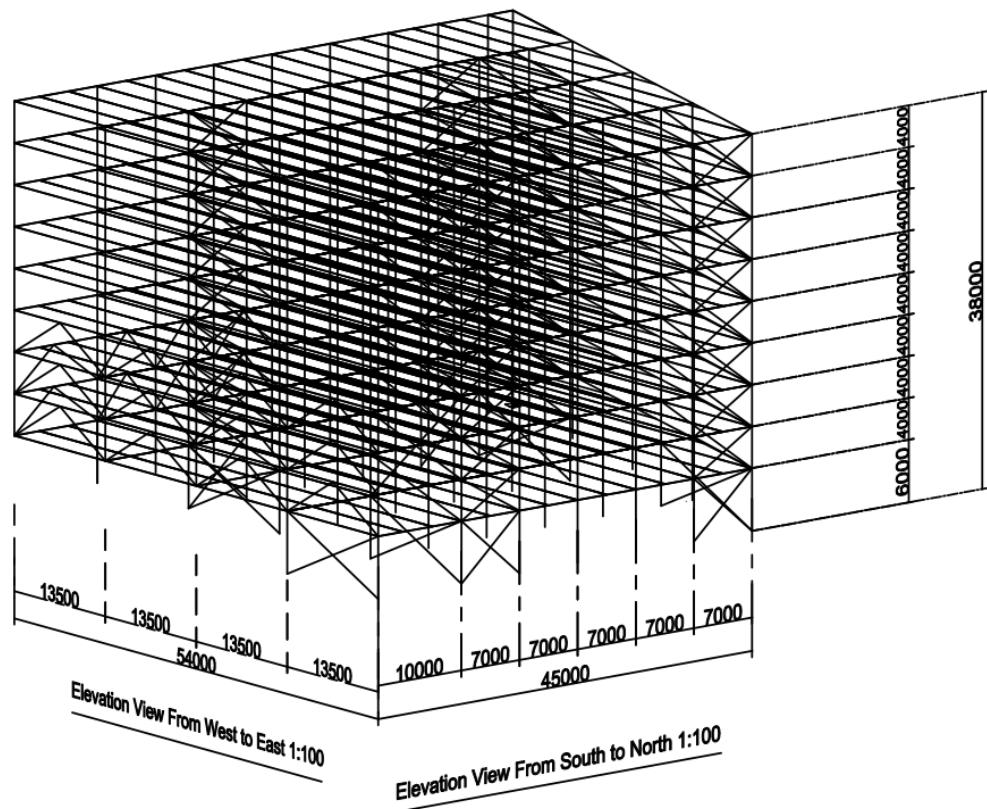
Global Structural Model for Proposal 2 (Autodesk)
